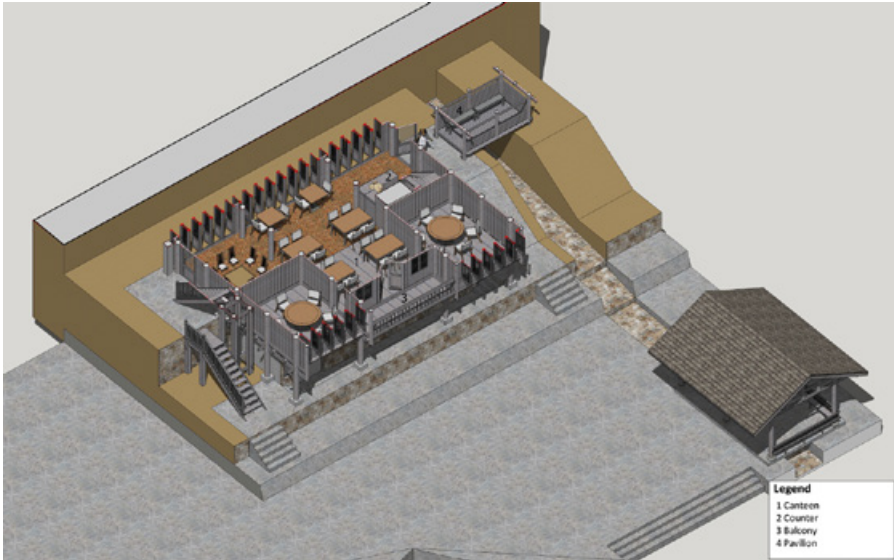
Lower floor plan of the canteen. (Source: Author)
